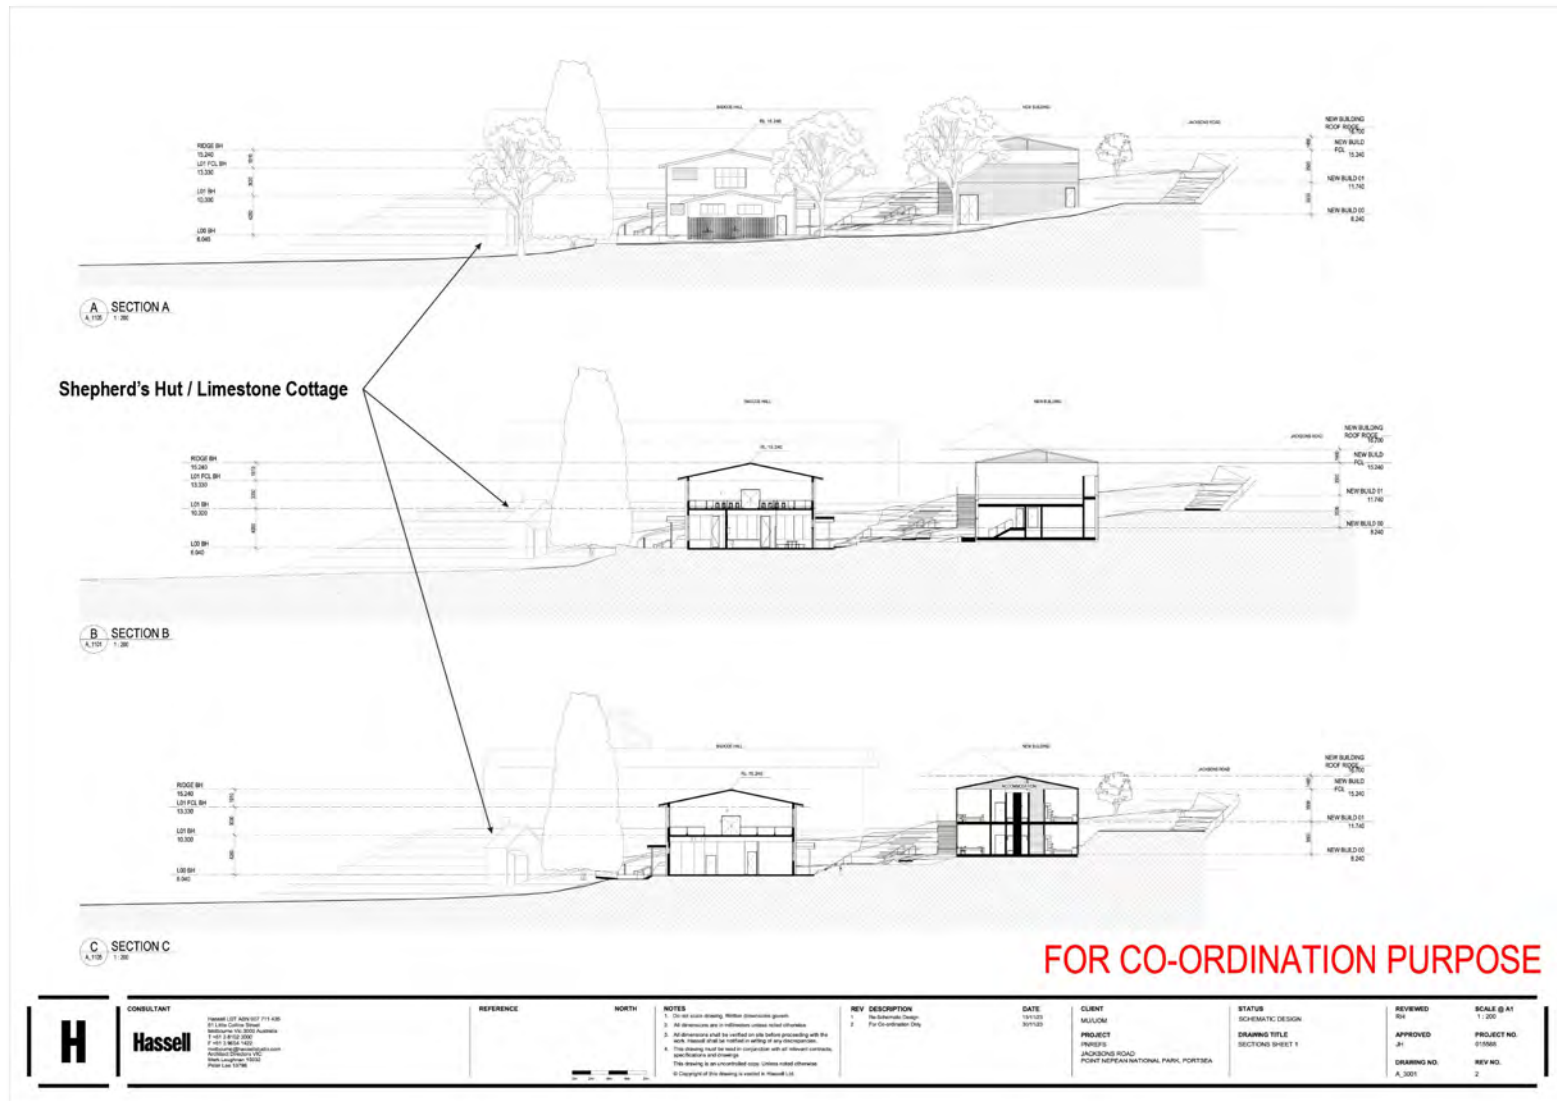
Development Section Plans showing buildings and limestone cottage in relation to each other. Document provided by UoM.
